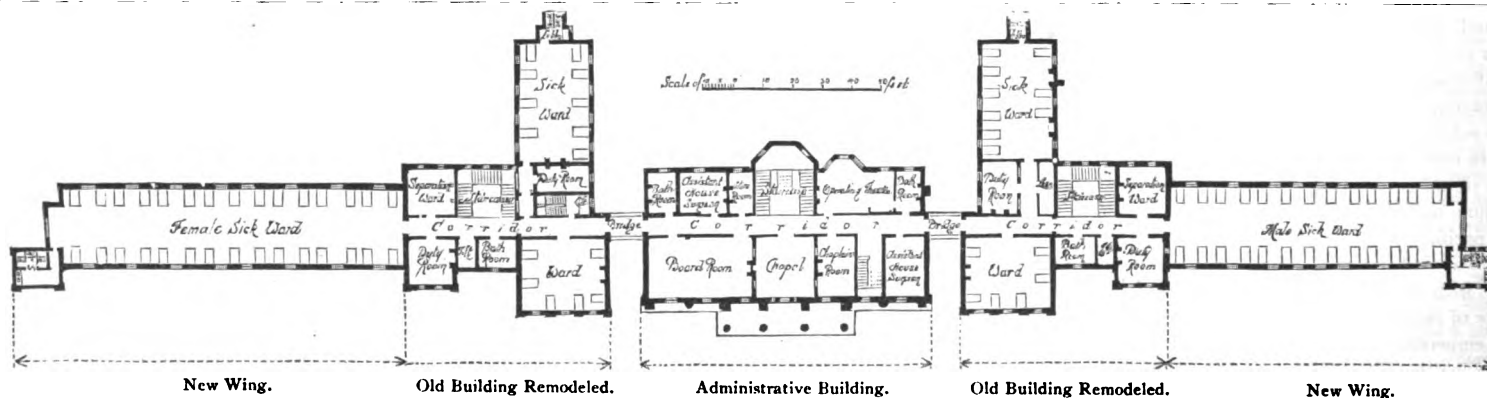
PLAN OF FIRST FLOOR AFTER ALTERATION.
